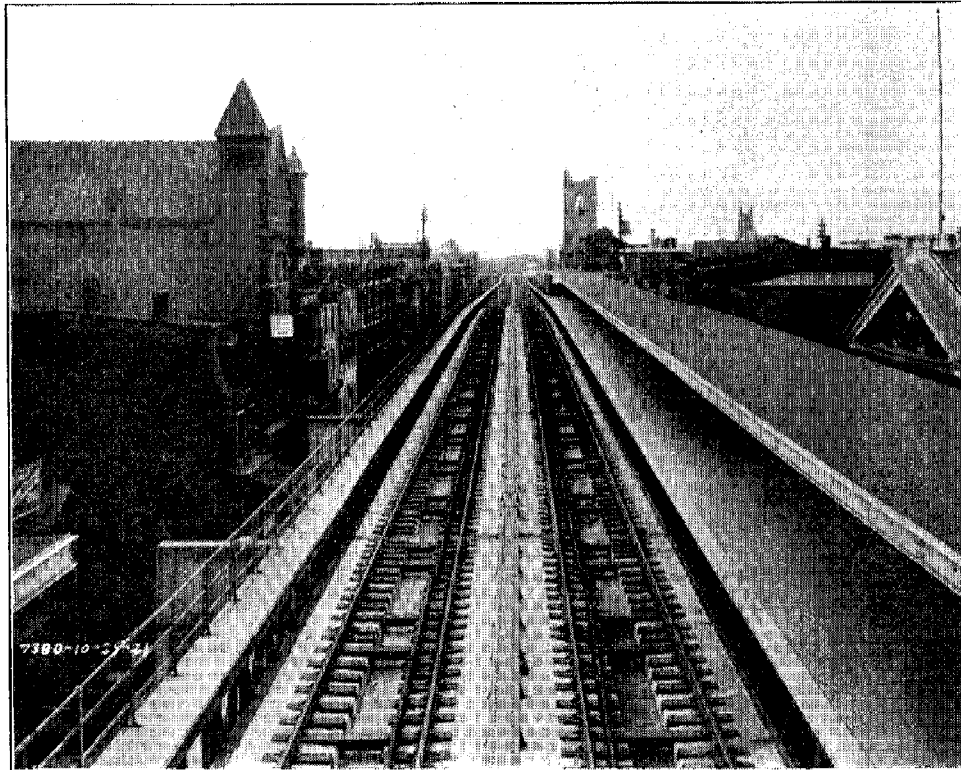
Concrete track construction at station on the Frankford Elevated Railway in Philadelphia.
